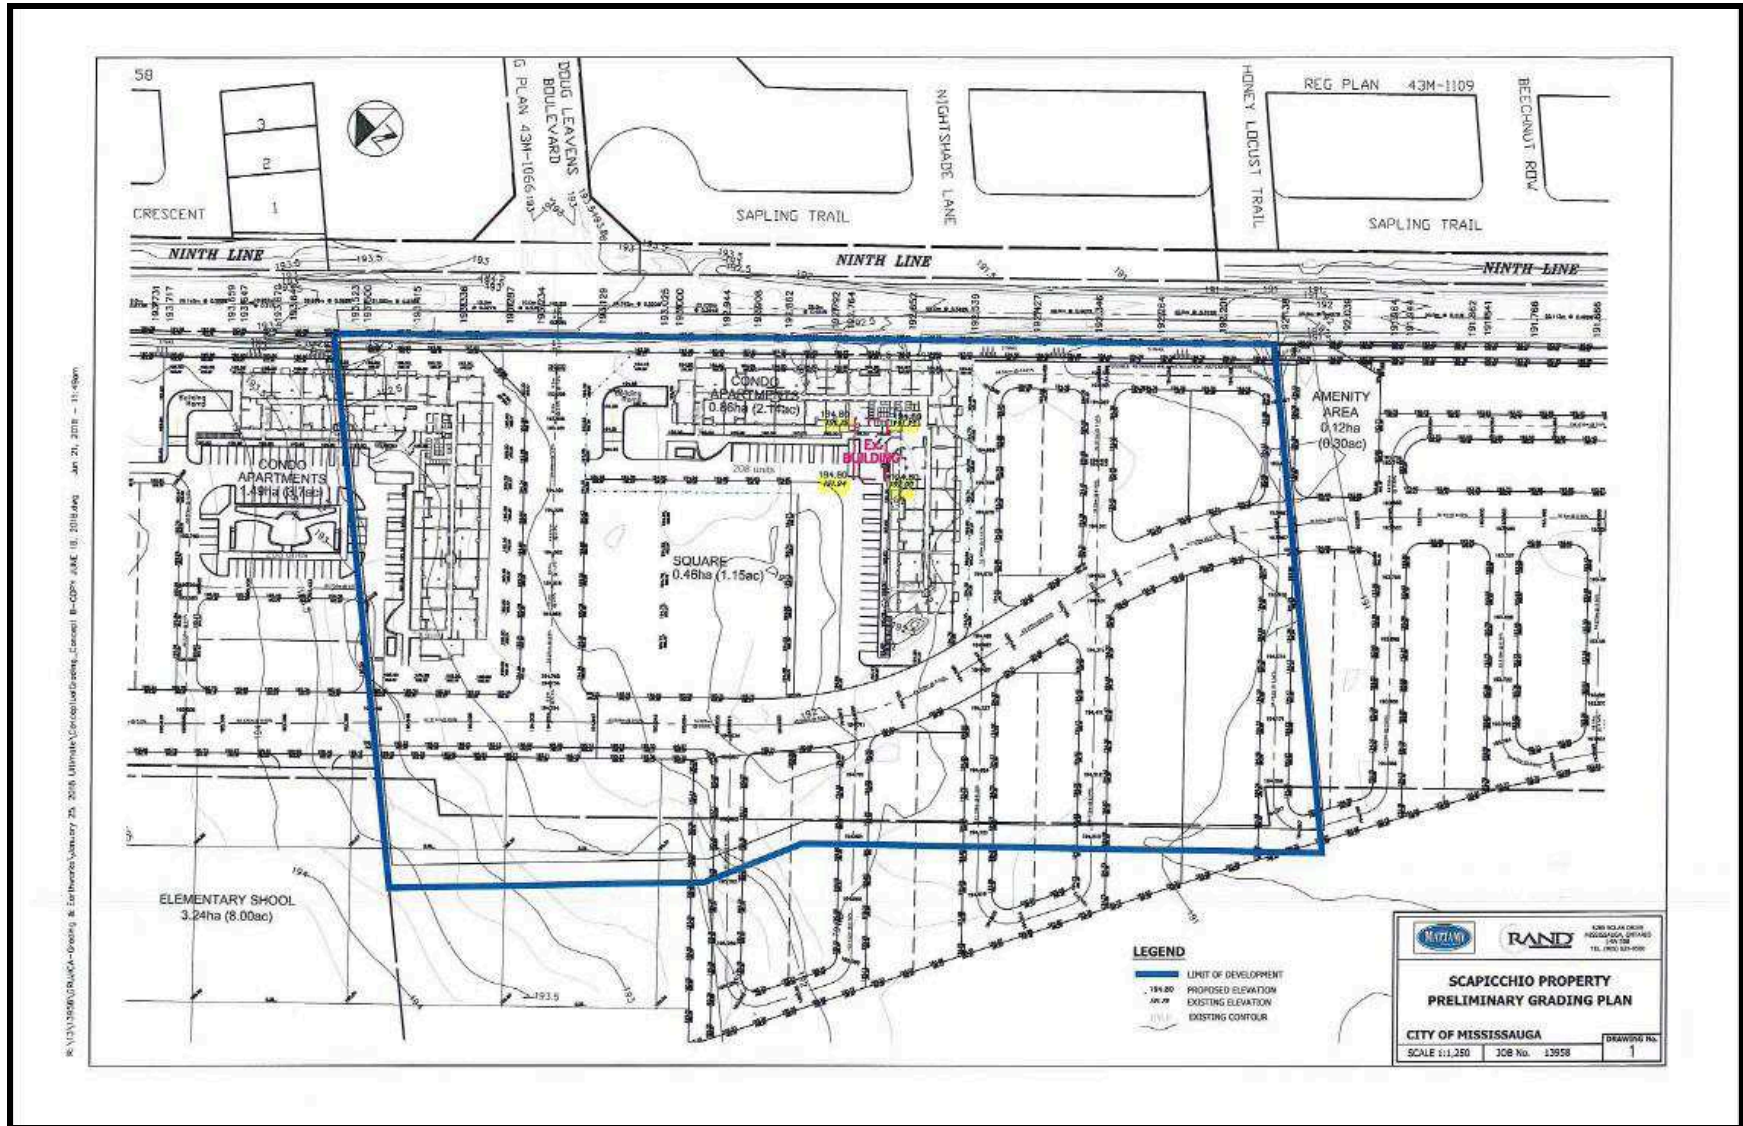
6432 Ninth Line Preliminary Grading Plan
